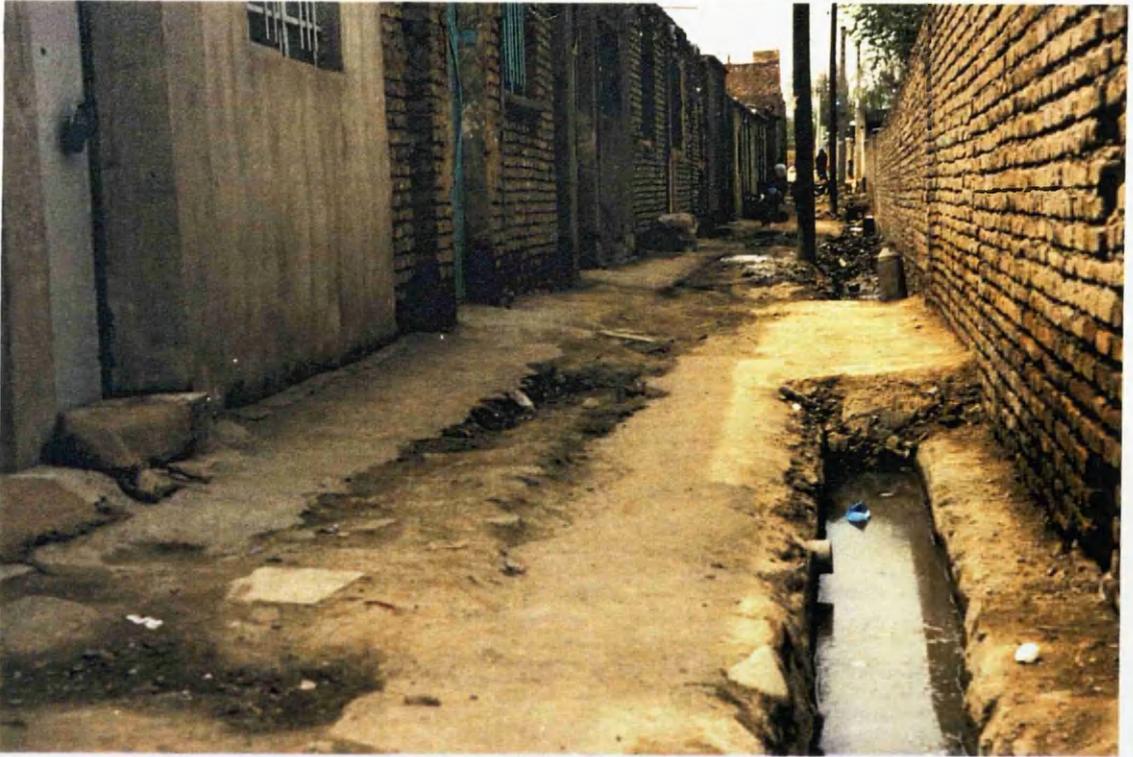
Stagnant water beside walls damages foundations as well as being unhygienic (Zoorabad).
